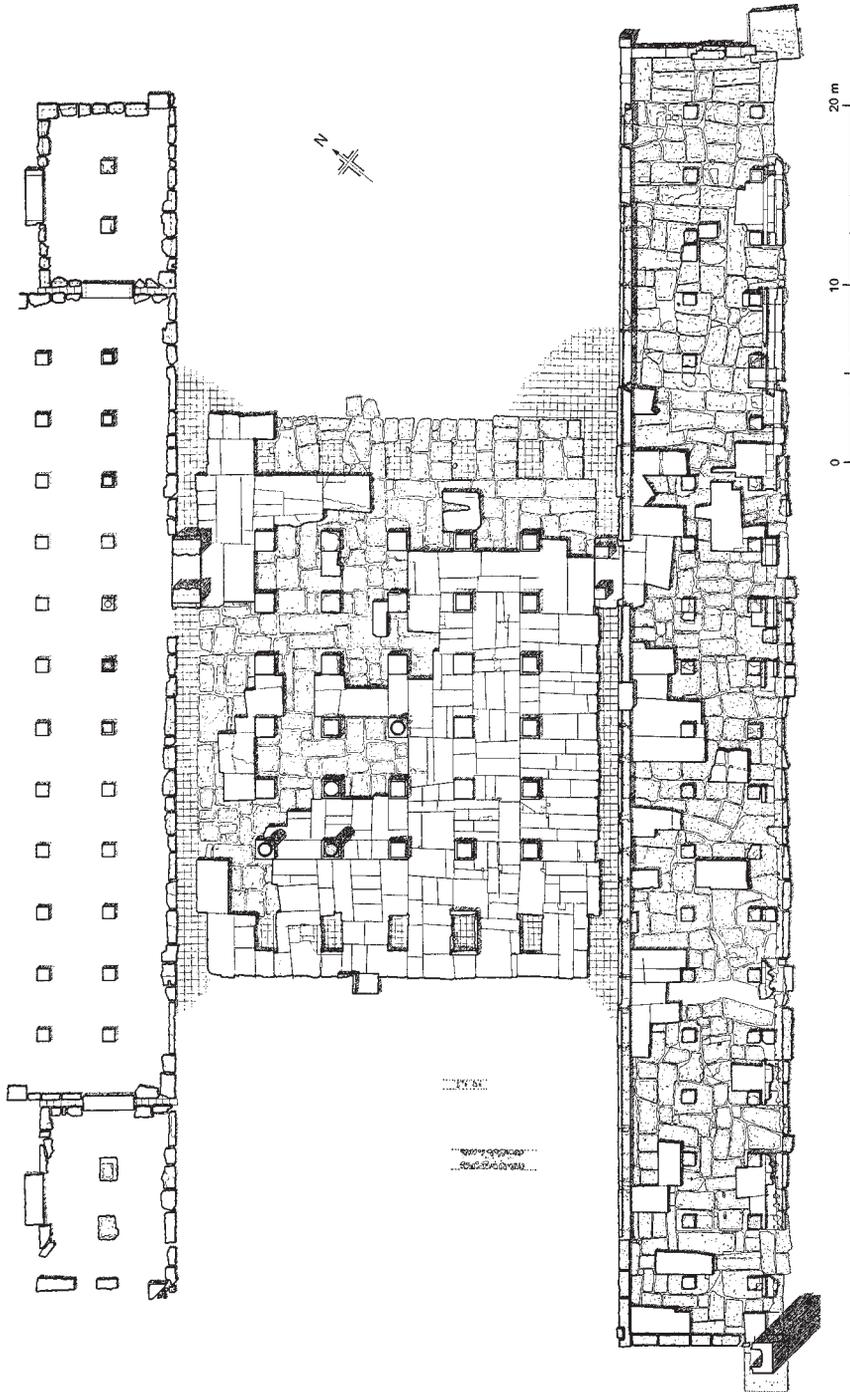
Pasargadae. Palace P. Excavation plan (after Stronach, 1978).
